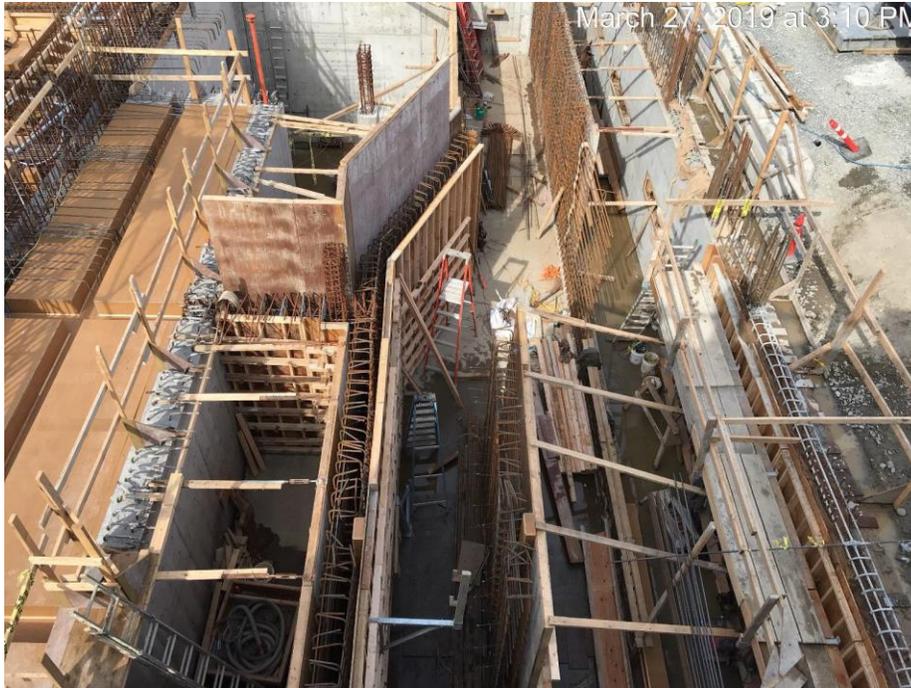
Clover Point Pump Station: Overview of inlet channel area.
